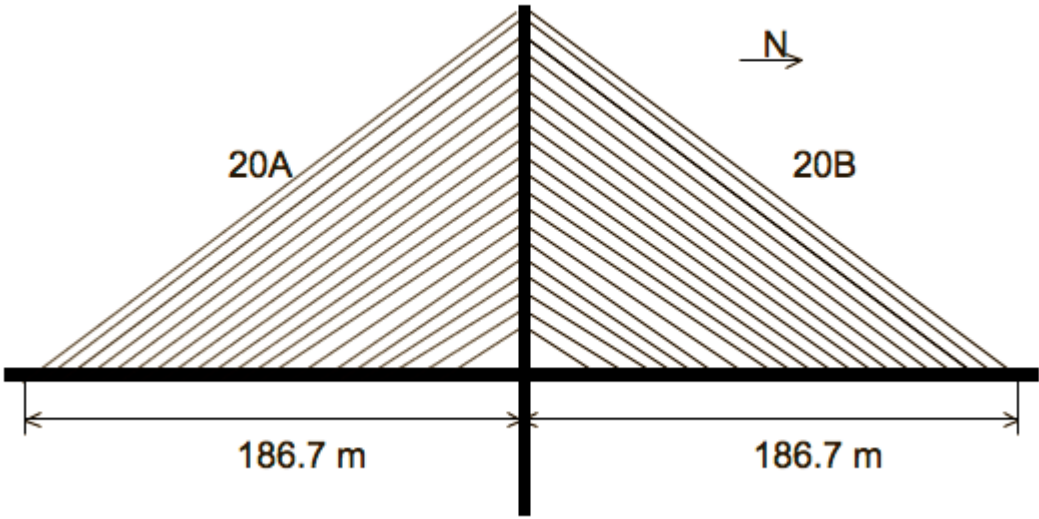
Plan View of VGCS Bridge (Kangas, 2009)
